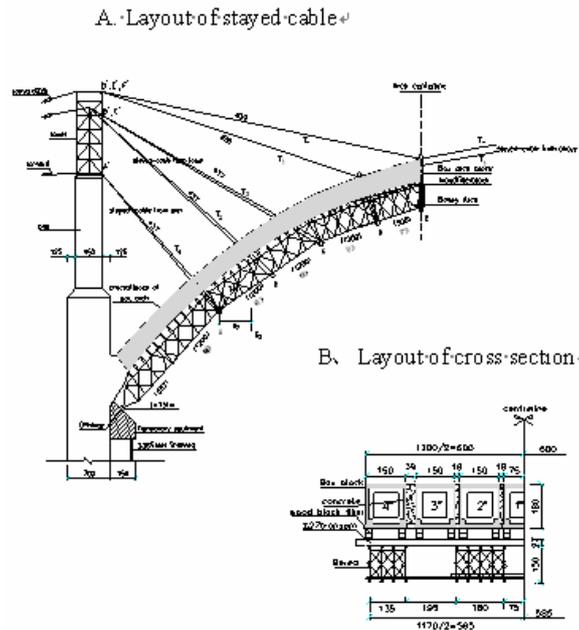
133m-long Cable-stayed Bailey Steel Arch Construction
